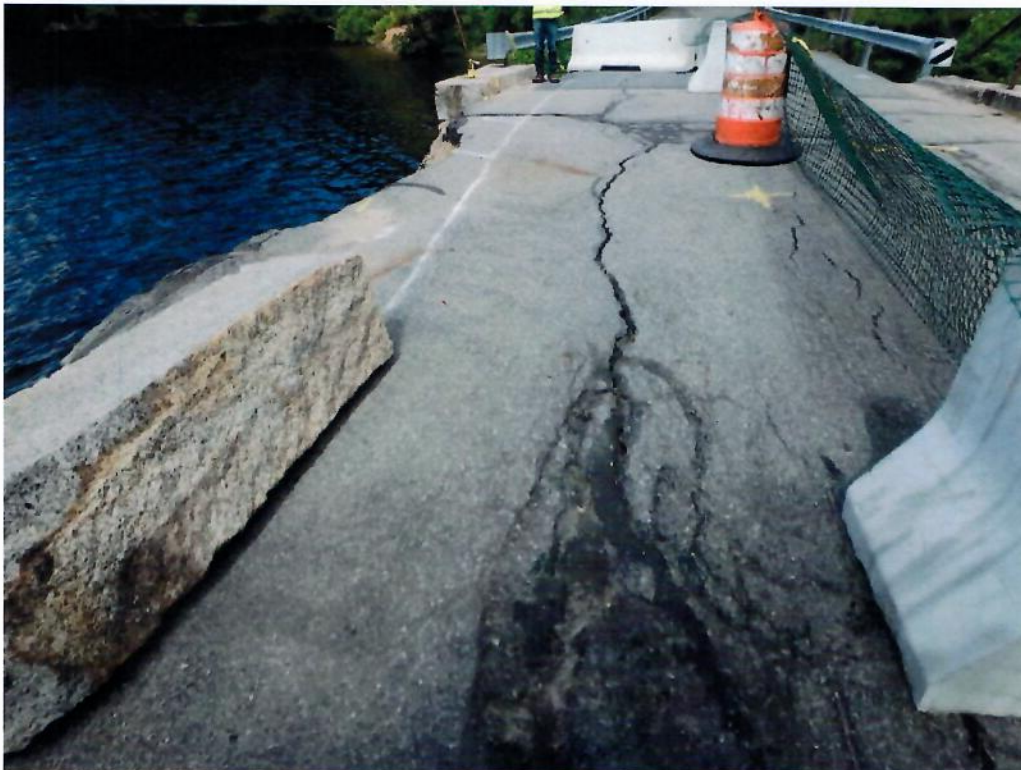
Failure of the spandrel wall at the southeast corner of the bridge.
